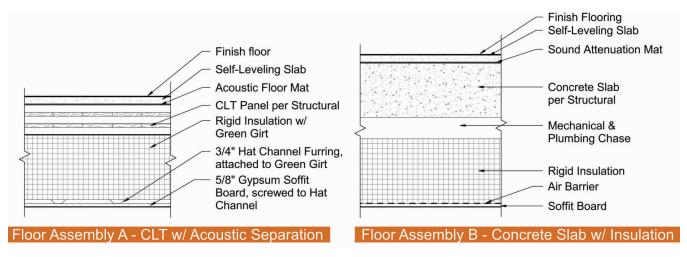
TYPICAL FLOOR ASSEMBLIES
